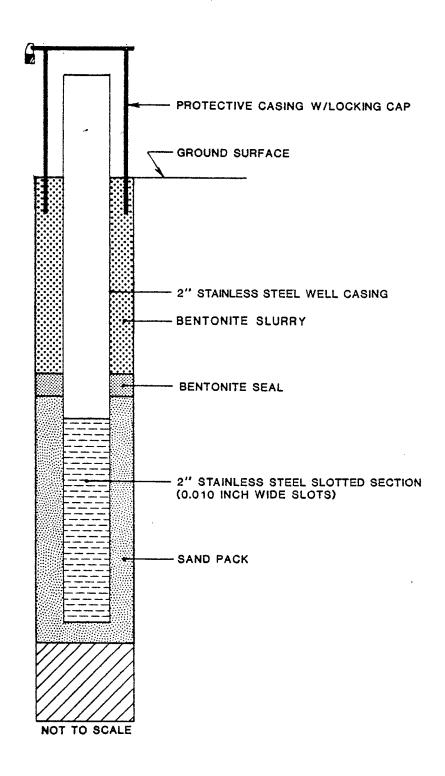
MONITORING WELL INSTALLATION DETAIL LOVE CANAL PROJECT NIAGRA FALLS, NEW YORK
